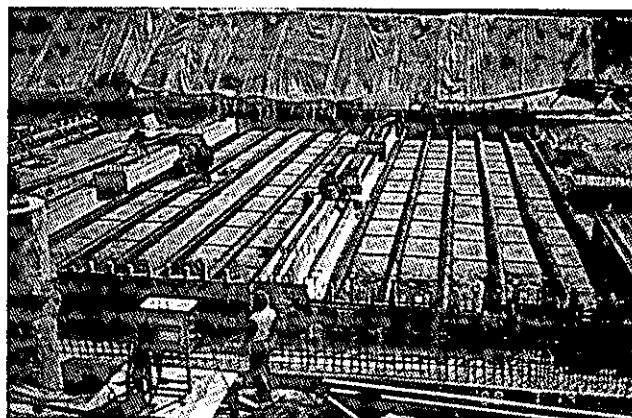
Large ground coupling system^[1] during construction. The pipes are brought into position before the basement slab is cast
